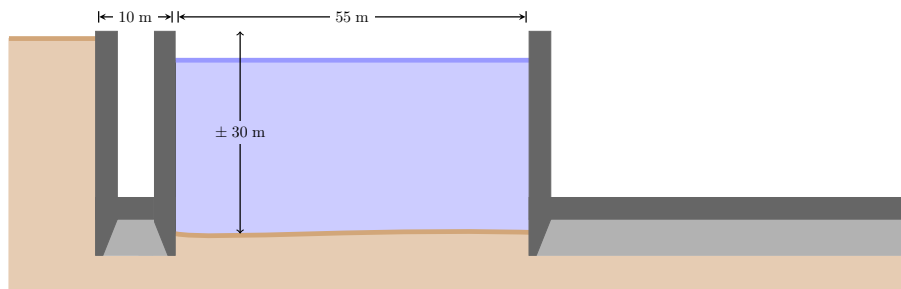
Excavation between both pneumatic caissons to a level equal to the lower side of the designed underwater concrete floor
